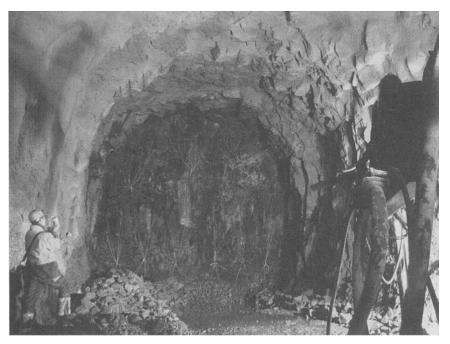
Excavation of a SCL tunnel using the drill and blast method
